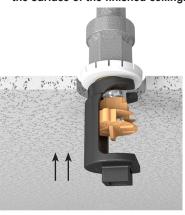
Recessed Installation (with Recessed Socket Wrench)
